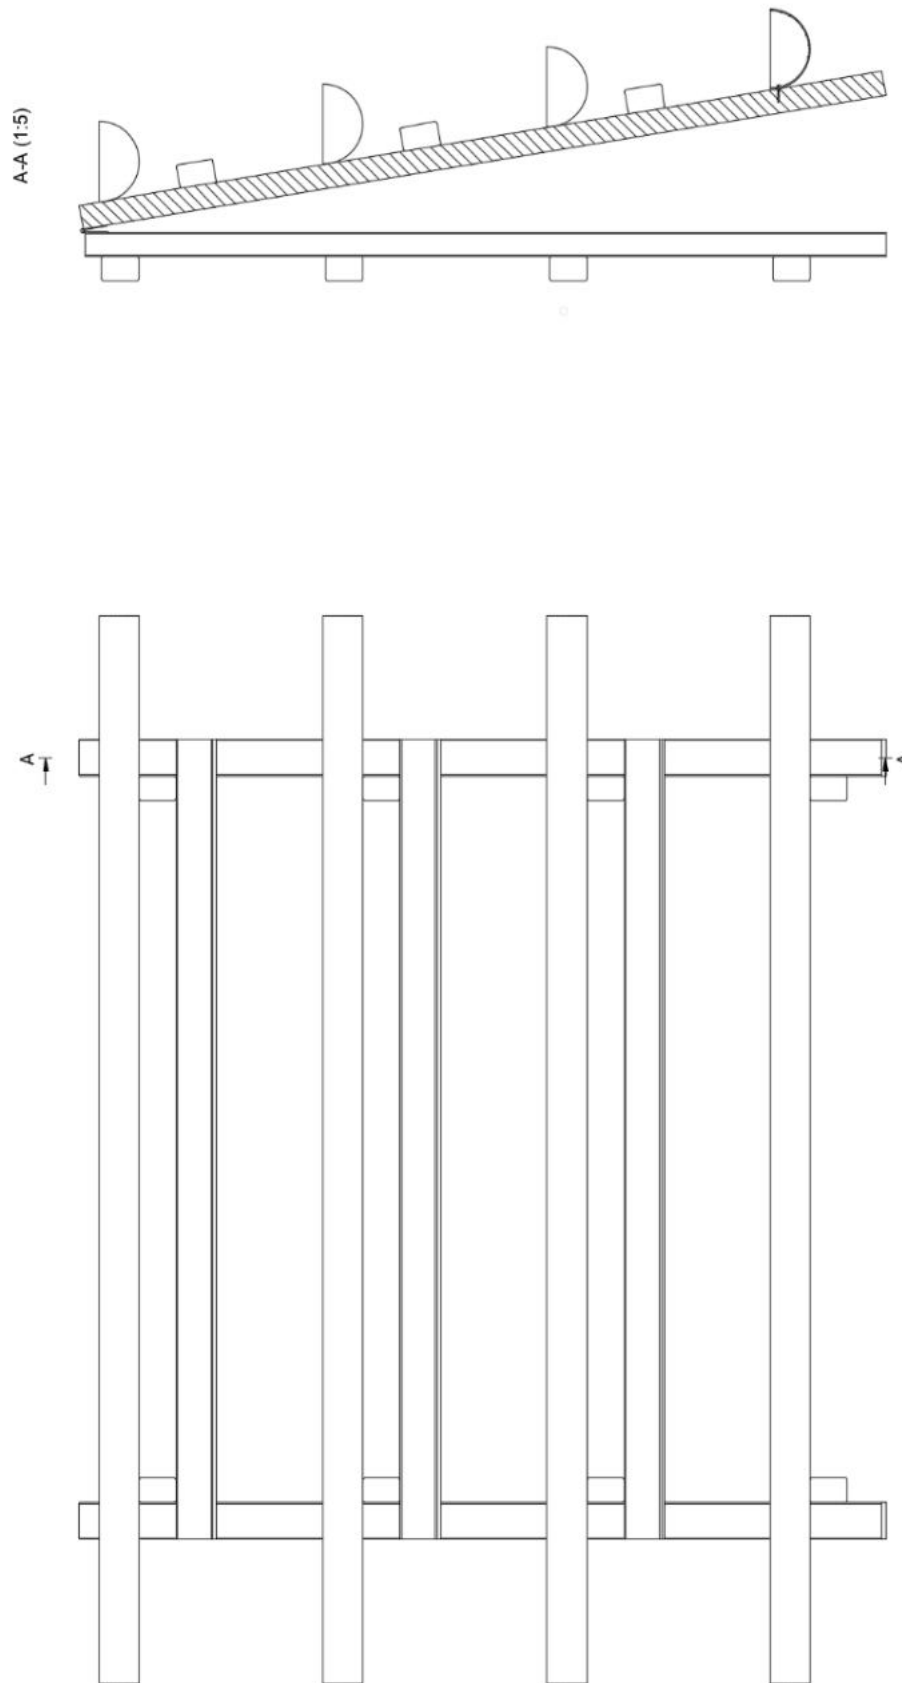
Attaching the rain gutters to the frame in a section detail, technical drawing.
